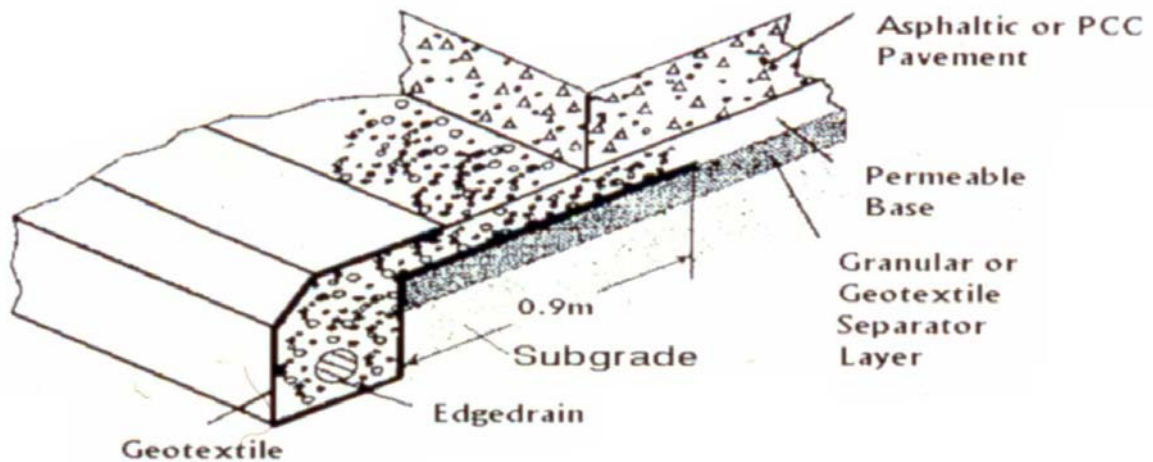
Design elements of a drainable pavement system (after FHWA, 1992).
